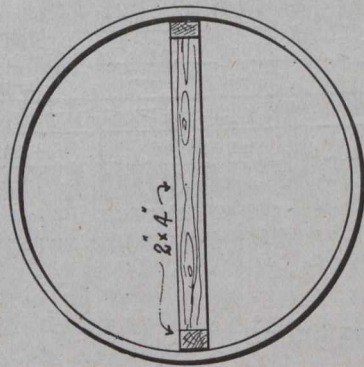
Showing Method of Bracing Large Sizes of Corrugated Iron Culvert.
